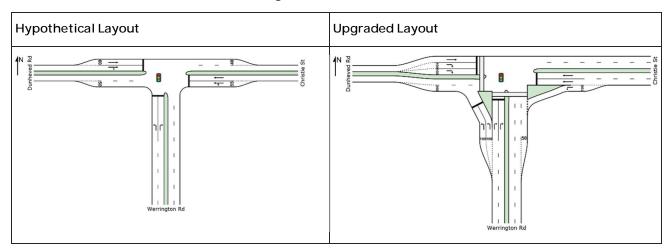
2031 with Links Road extension - Christie Street, Dunheved Road and Werrington Road
